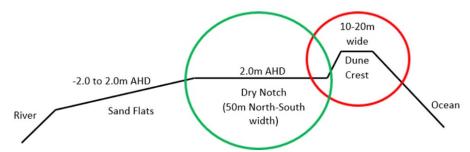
Cross SECTION of Shoalhaven River Entrance at Shoalhaven Heads
